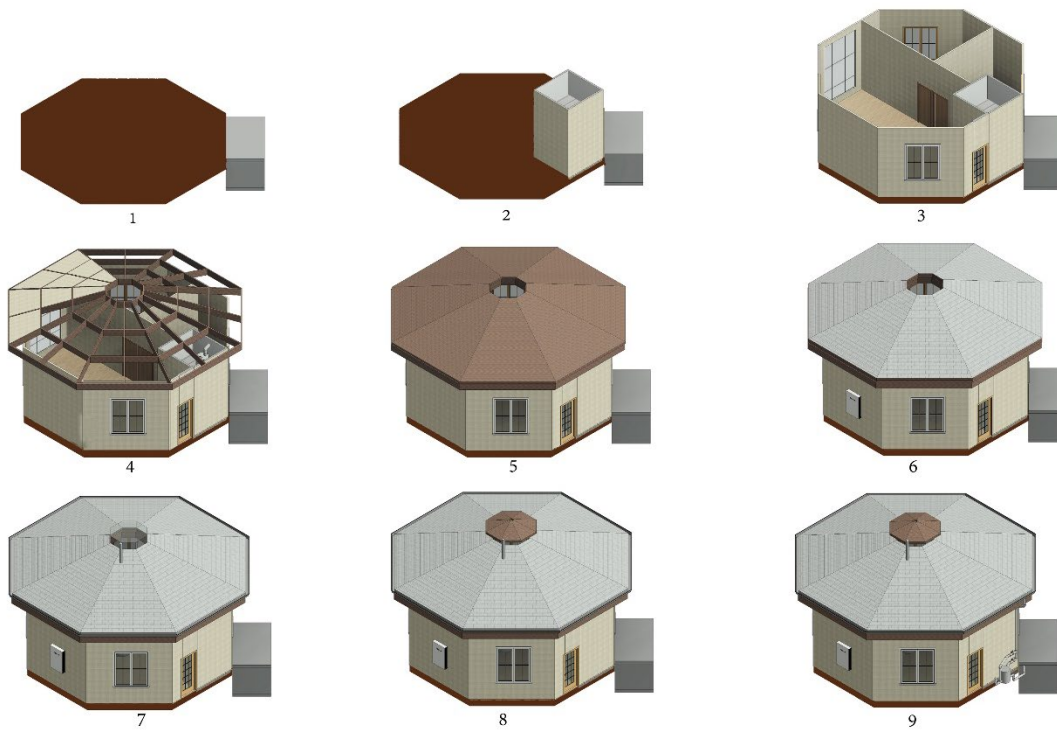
Construction Steps of the Proposed Hogan Style House Design
